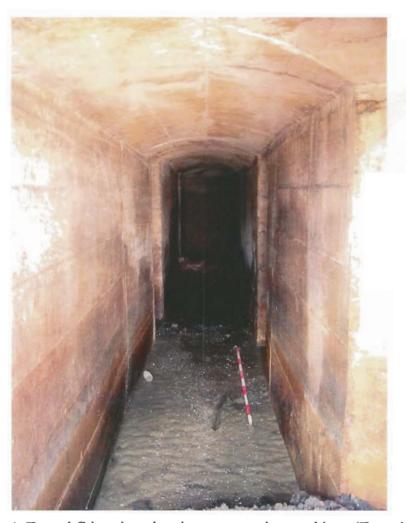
Tunnel C interior, showing construction markings (Tunnel C)
